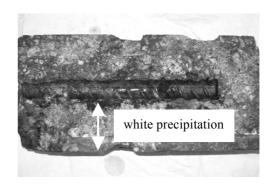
Chloride ion penetration into concrete (T7 specimen) after exposed to constant voltage of 30V.
